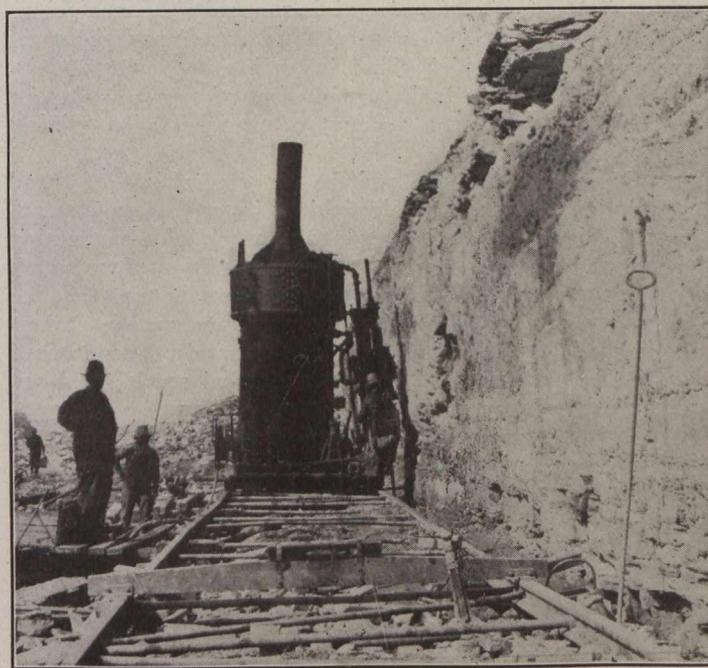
Rock Channelling Outfit at Work on Section 3.
